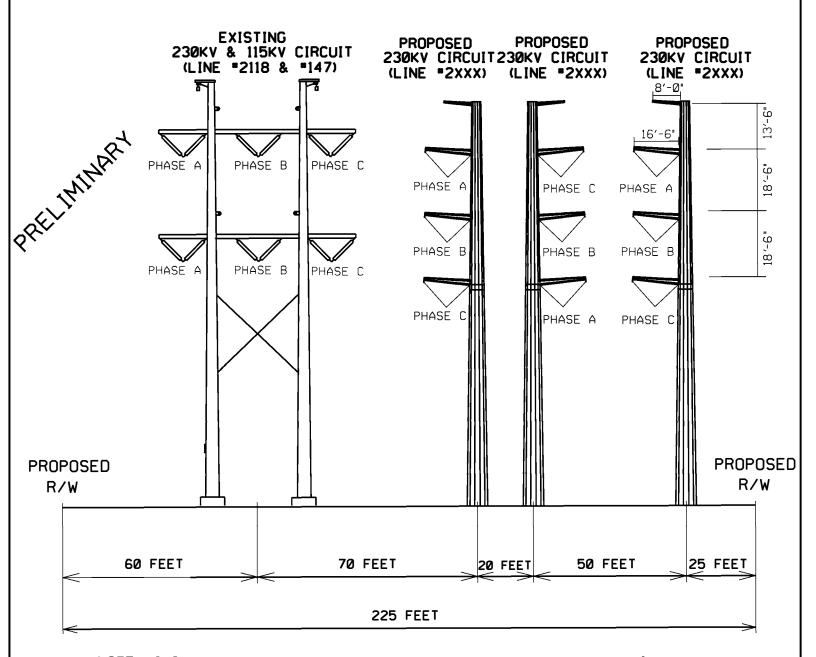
Typical Design and Layout for Collocation with TL-2118/147
